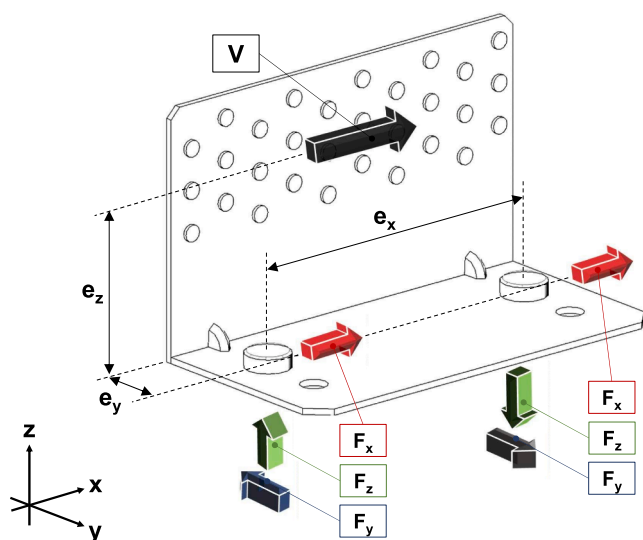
Traditional angle bracket in a wall-to-foundation joint configuration under horizontal-shear load: typical force distribution on anchor bolts.
